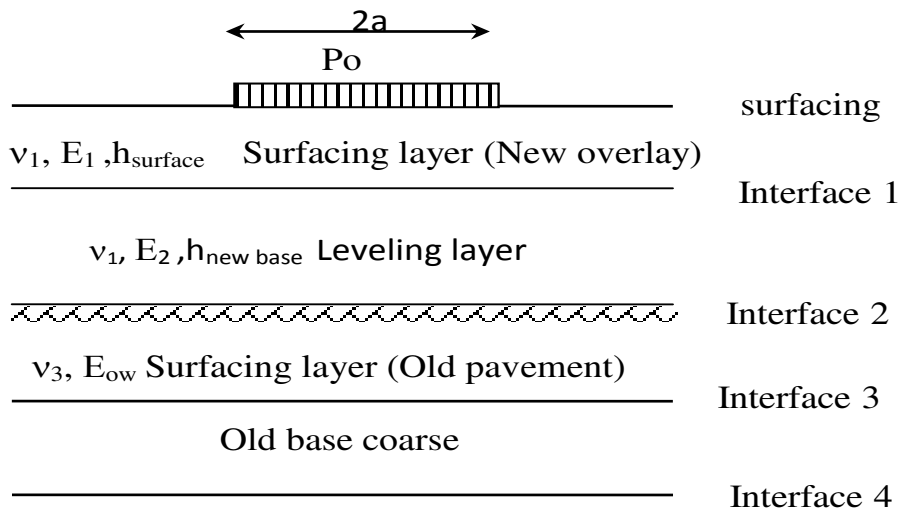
Typical cross section of two layers overlay old wearing surface (case one)
